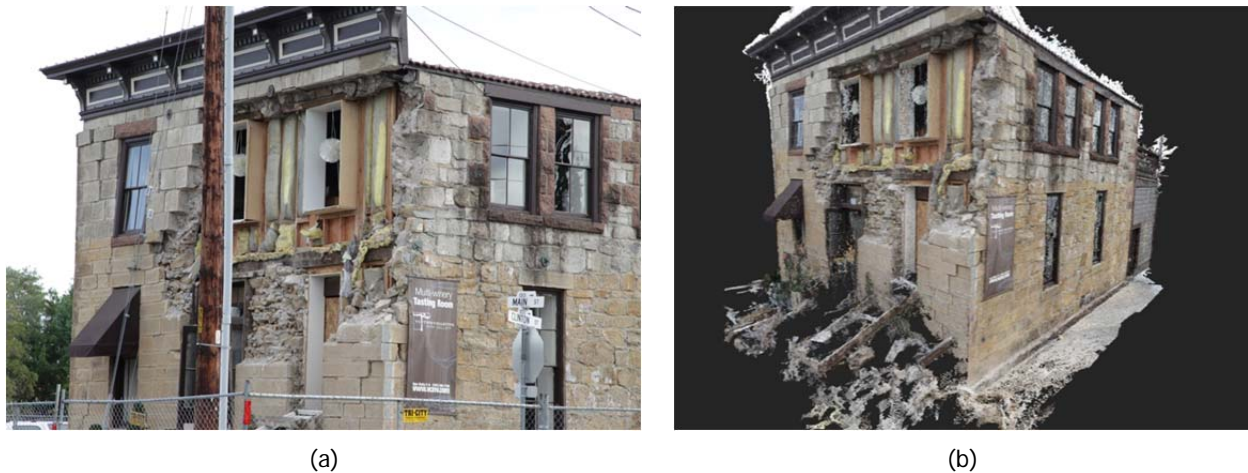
(a) Ground view and (b) reconstructed model showing façade damage and debris field.
